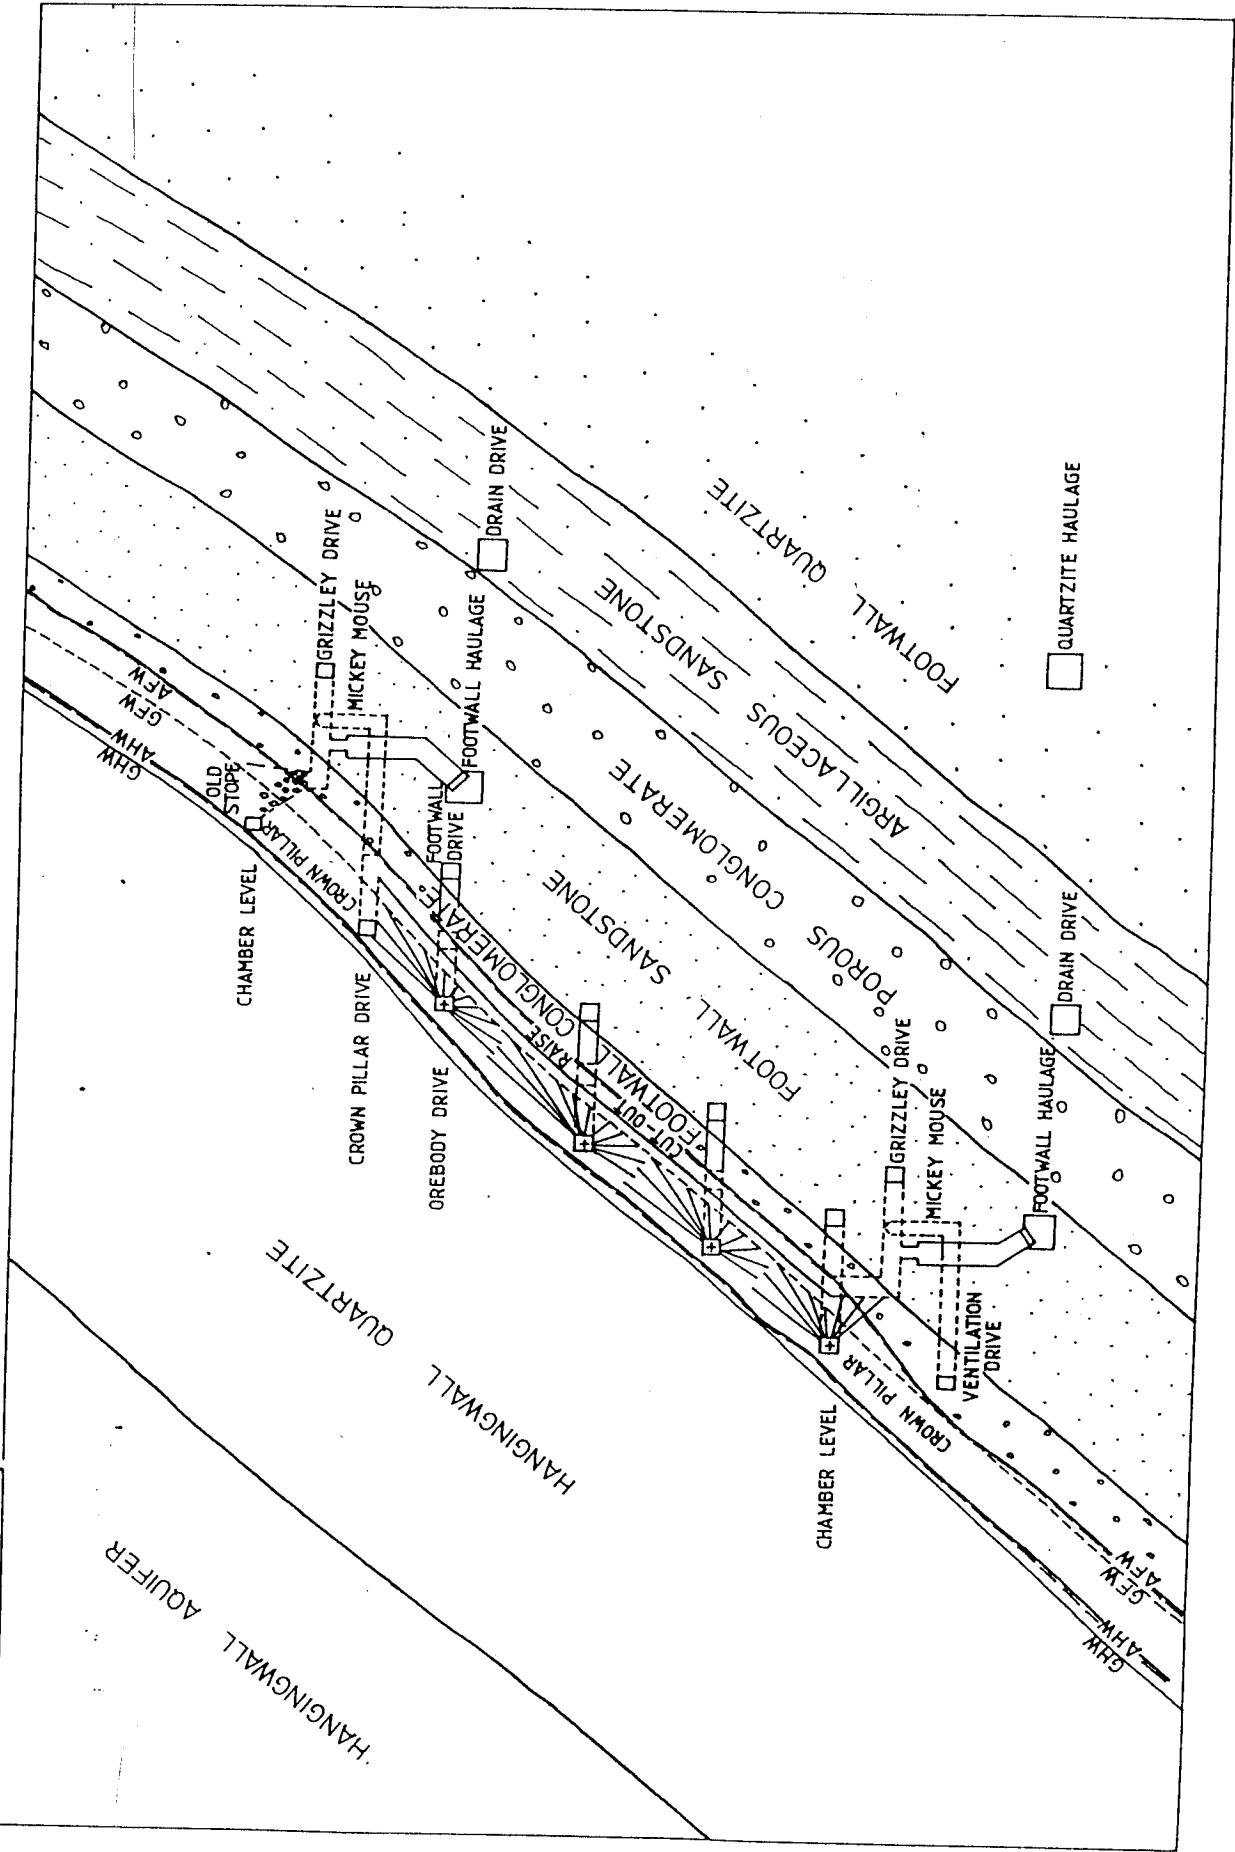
MINING LAYOUT FOR GRAVITY STOPING AT NO.1 SHAFT - KONKOLA MINE
